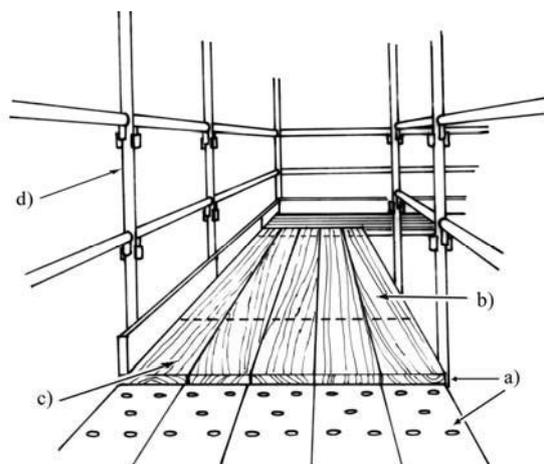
Overlapping planks. Lapped scaffold planks may sometimes be used to cover gaps around corners of scaffold bays. These planks generally may not need to be secured, provided the following are met:
